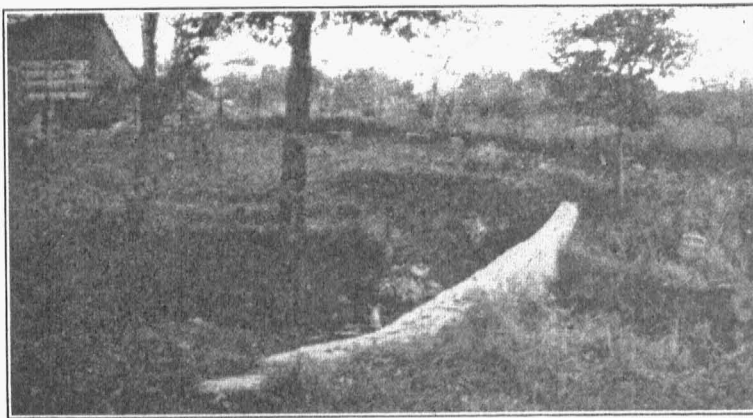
Masonry dam built across a gully draining a large area of land near Kansas City, Missouri.
